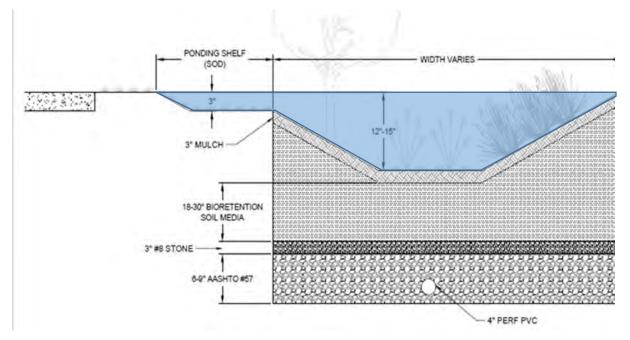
"Standard" Bioretention Typical Section with Ponding Shelf
